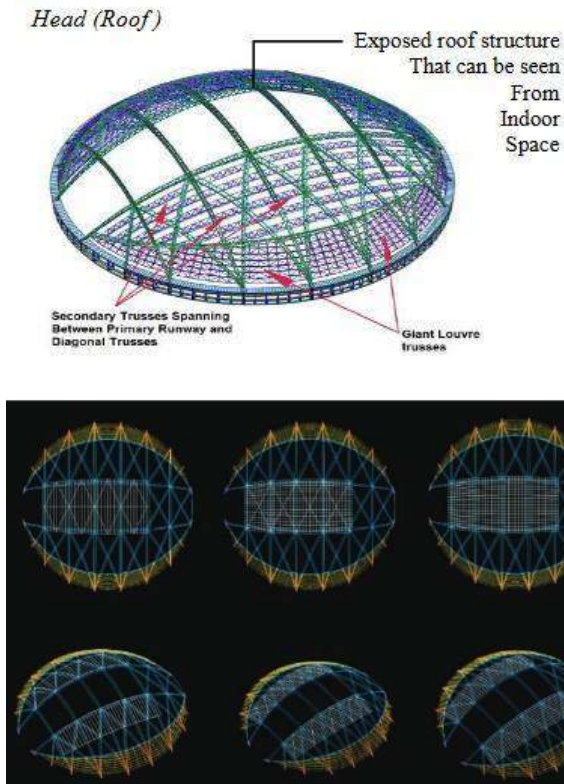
Left: Moving Roof and Louvers Source: Tekla. (n.d.). Singapore Sports Hub National Stadium roof: Moving roof and louvers. Tekla Campus. <https://campus.tekla.com/singapore-sports-hub-national-stadium-roof> Right Retractable Roof and Trusses Hladik, P., & Lewis, C. J. (2010). Singapore National Stadium roof. *International Journal of Architectural Computing*, 8(3), 309–328. <http://papers.cumincad.org/data/works/att/ijac20108302.pdf>
